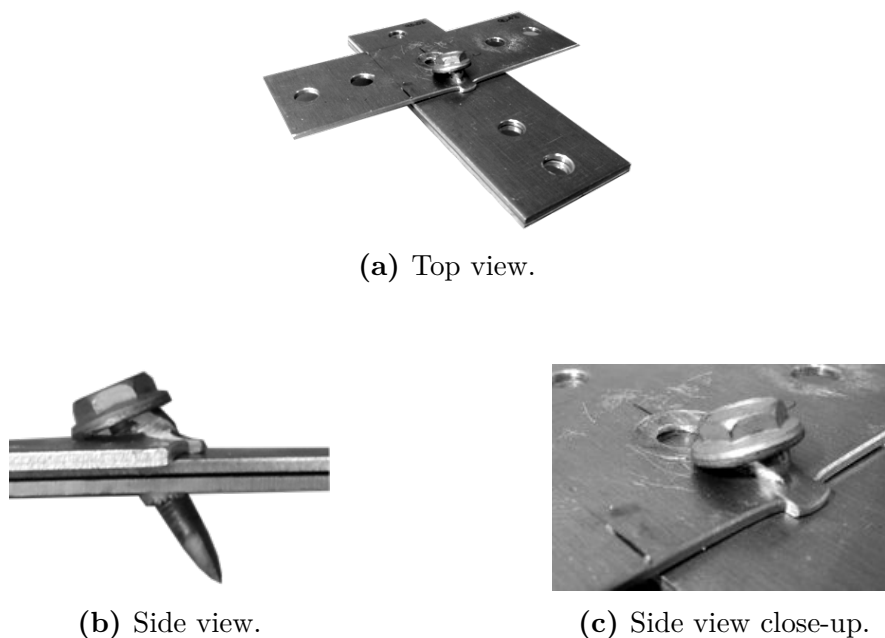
Deformation of cross type 3 specimen under shear loading.
